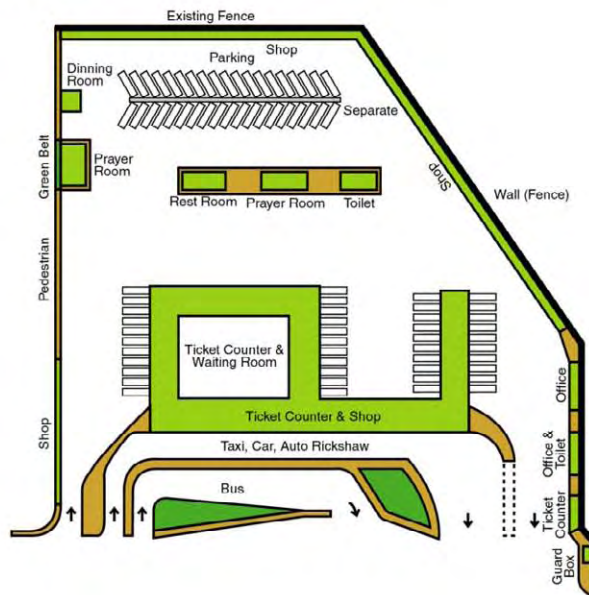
Plan Layout & Present Layout for Mohakhali bus terminal
